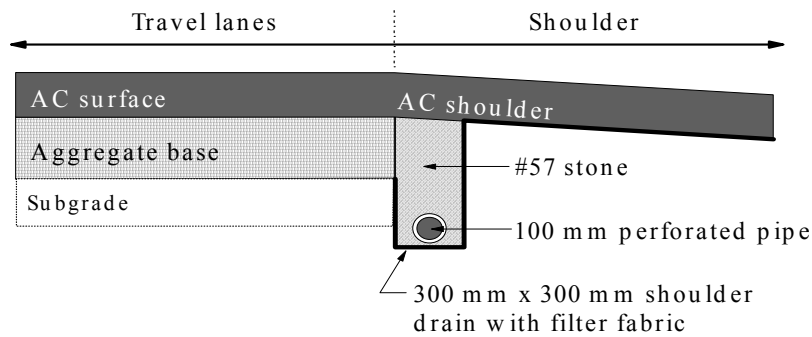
Typical AC pavement with pipe edgedrains (ERES, 1999).
